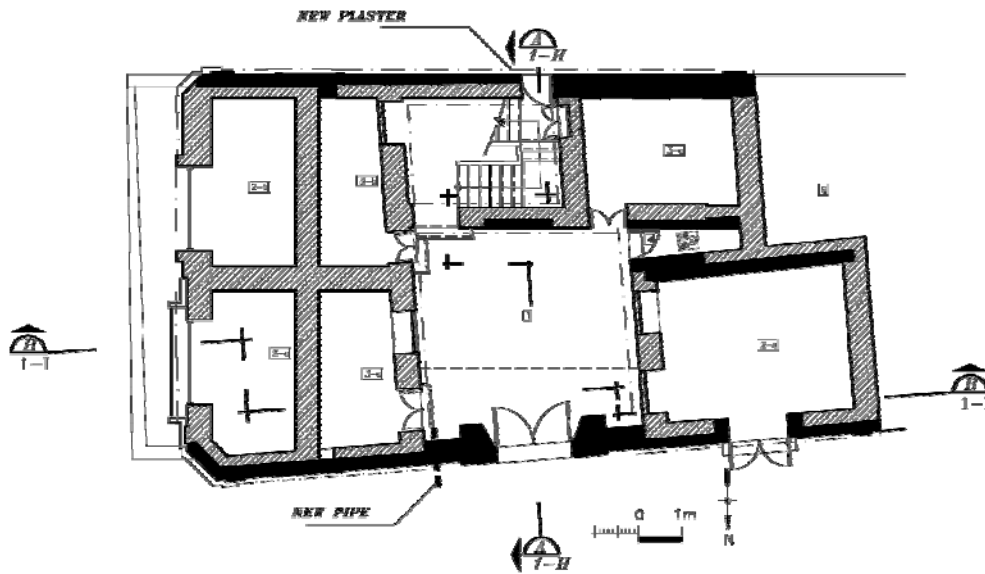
Bayt Sukkar: Ground floor plan – the restored parts of the walls are shown in the dark solid highlight
